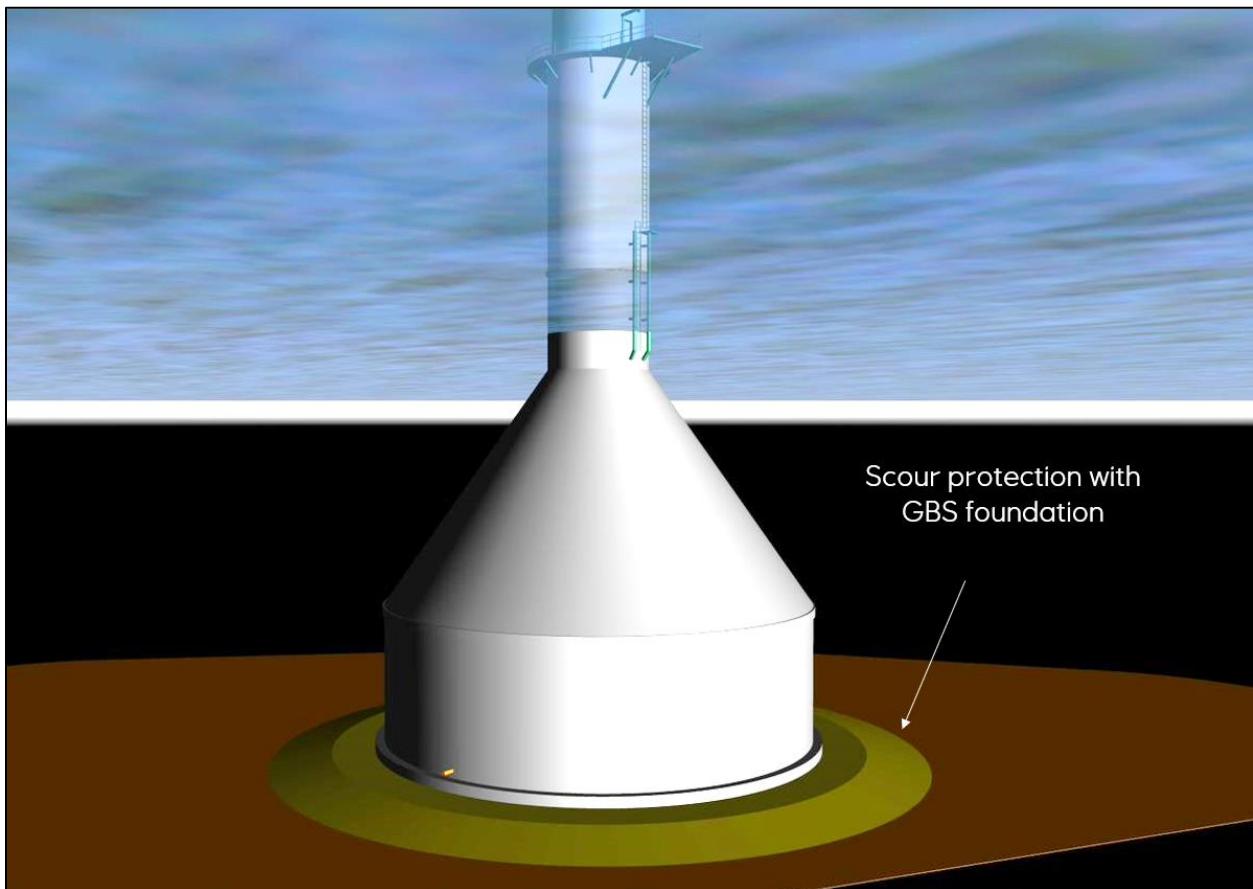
Example of Scour Protection Installation for GBS Foundation
